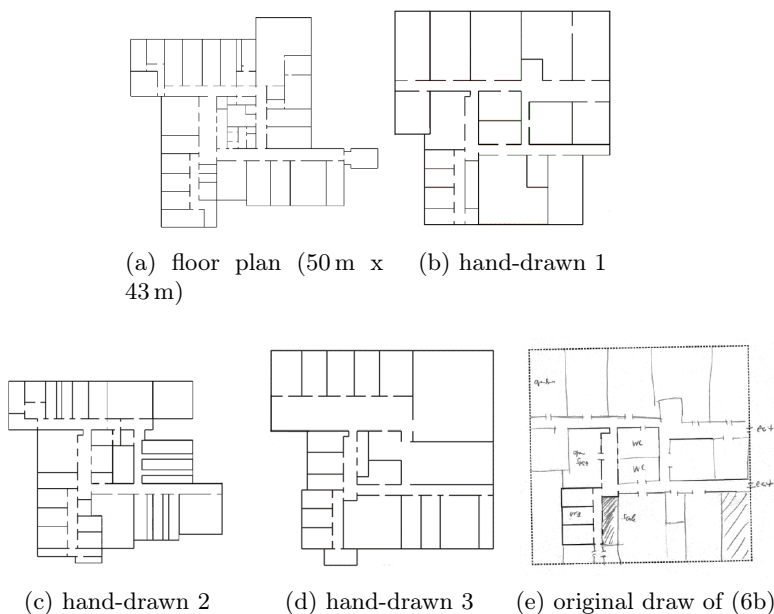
The correct floor plan (6a), three hand-drawn floor plans (6b-6d), and an original draw (6e).
